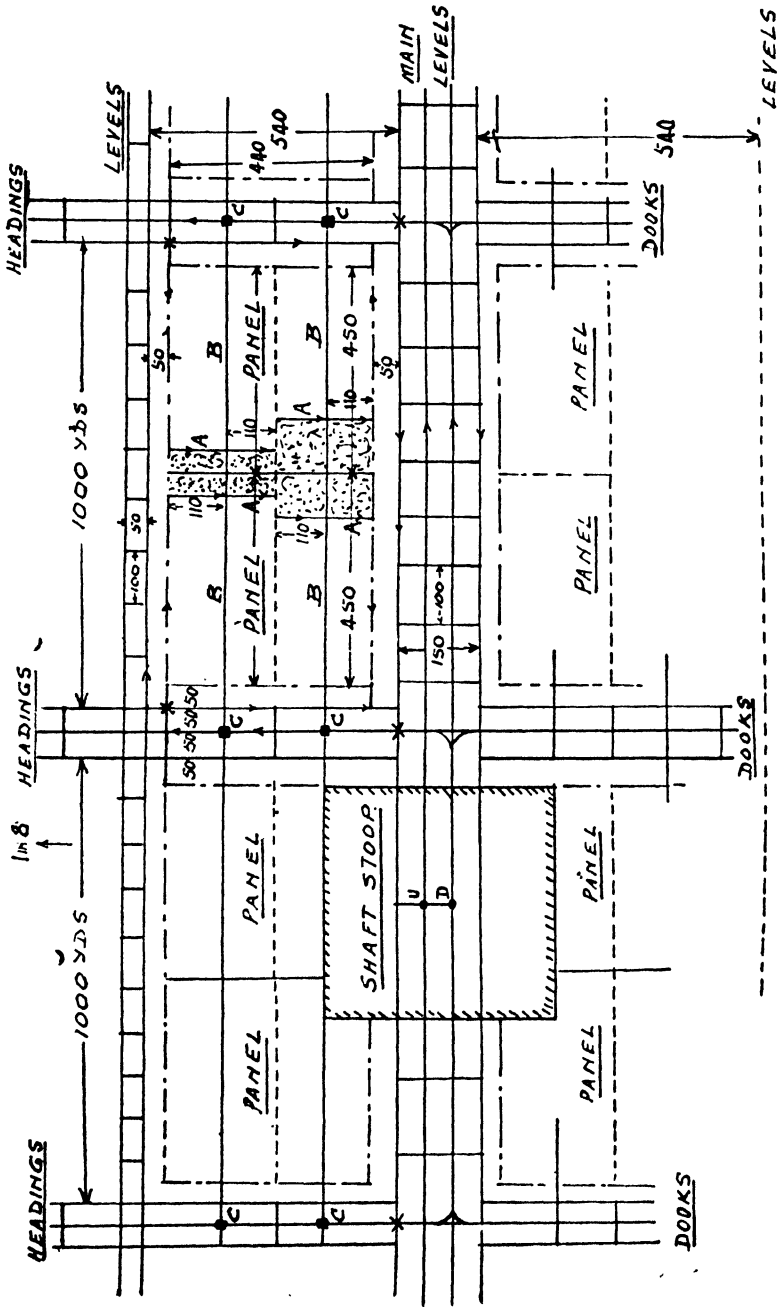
Plan showing Design of Longwall Retreating Workings.
